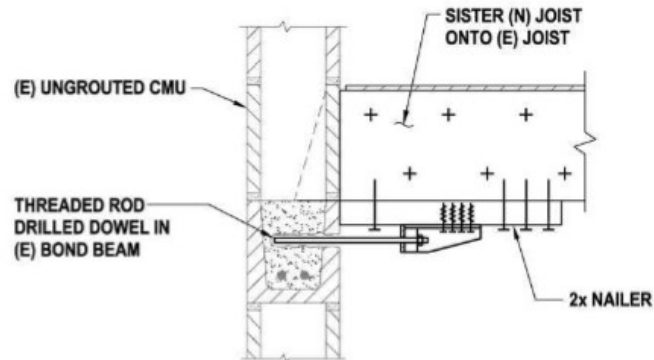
Wall-to-Floor Tension Tie in Hollow Masonry Alternate
